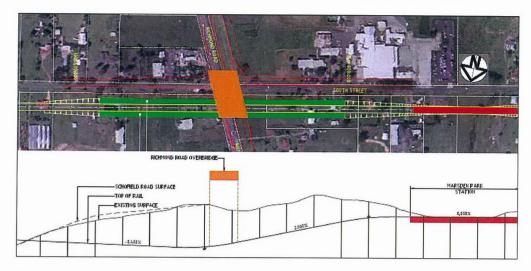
Proposed Transport Corridor Alignment and indicative Cross Section Source: Hyder Consulting
